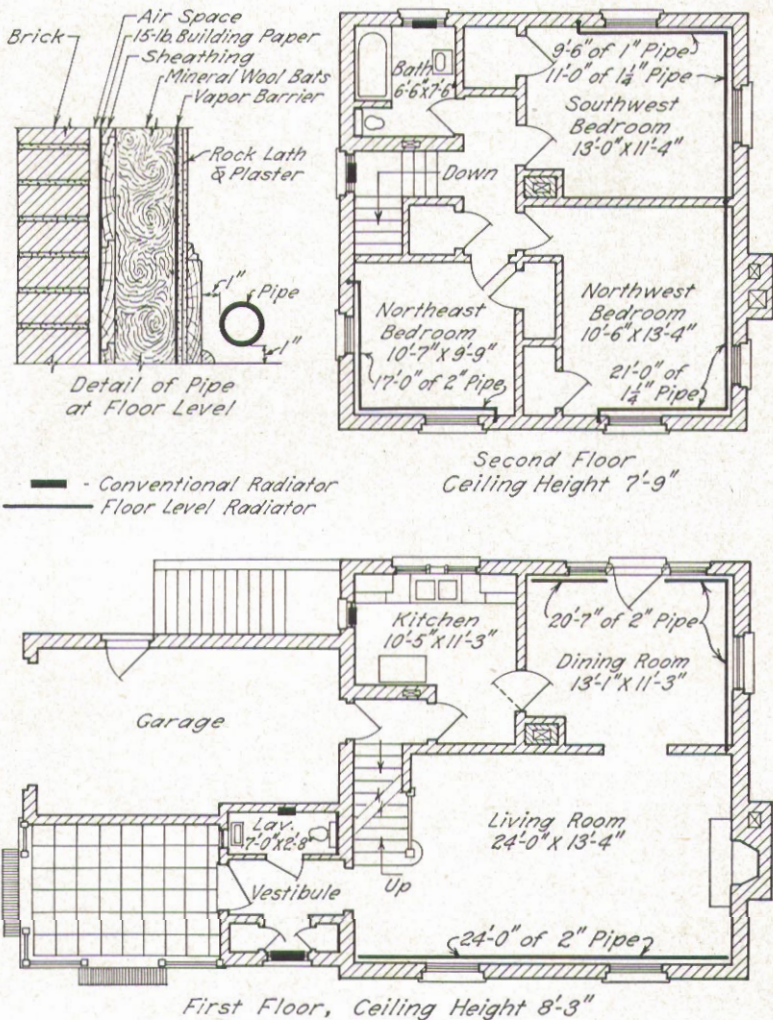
FIRST- AND SECOND-STORY PLANS SHOWING LOCATIONS OF PIPE AT FLOOR LEVEL, SERIES R
